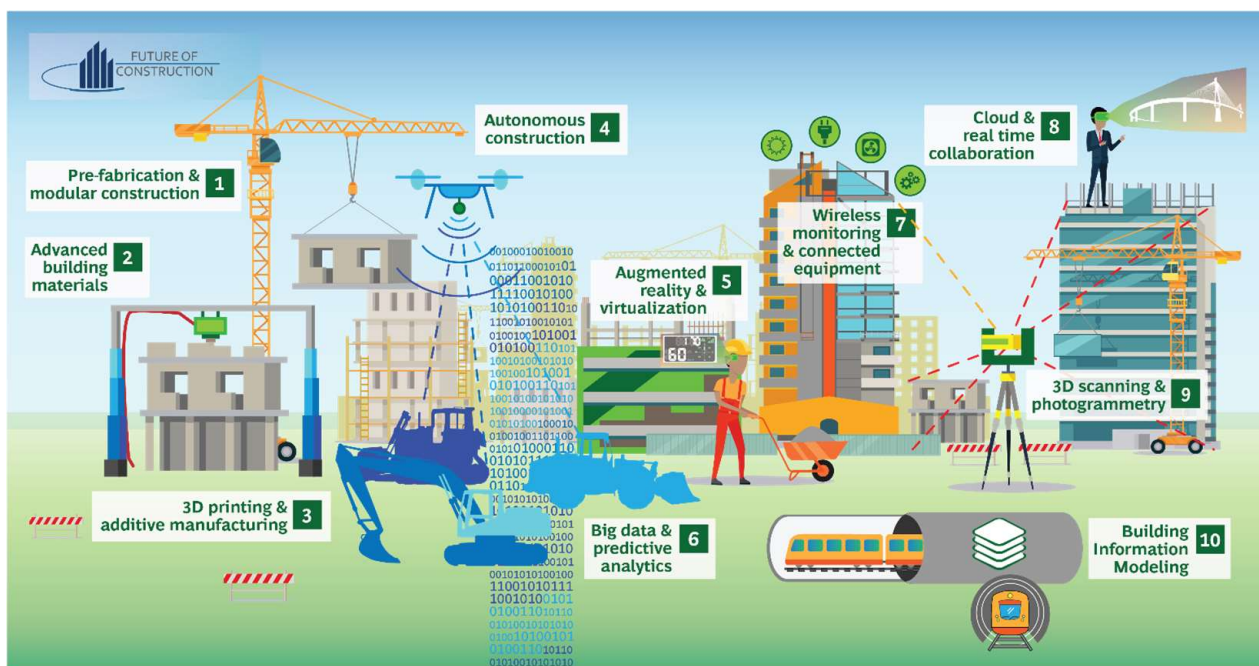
Technologies used in Construction 4.0. <https://www.weforum.org/agenda/2018/03/how-construction-industry-can-build-its-future/> (accessed on 1 May 2024).
